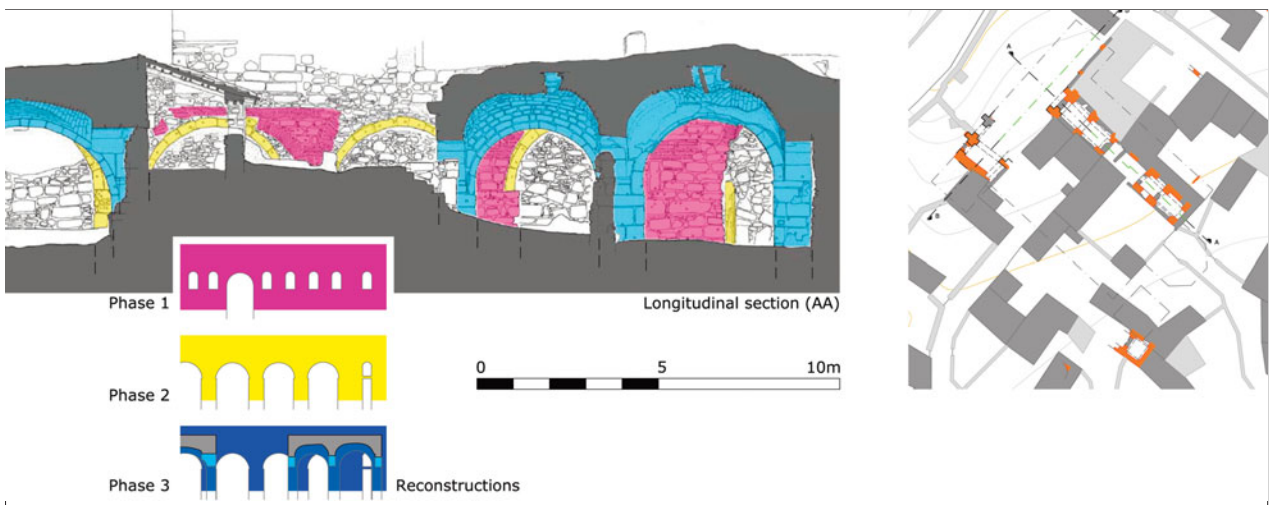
Germia, Church of St Michael: northern aisle, longitudinal section looking north and partial reconstructions
